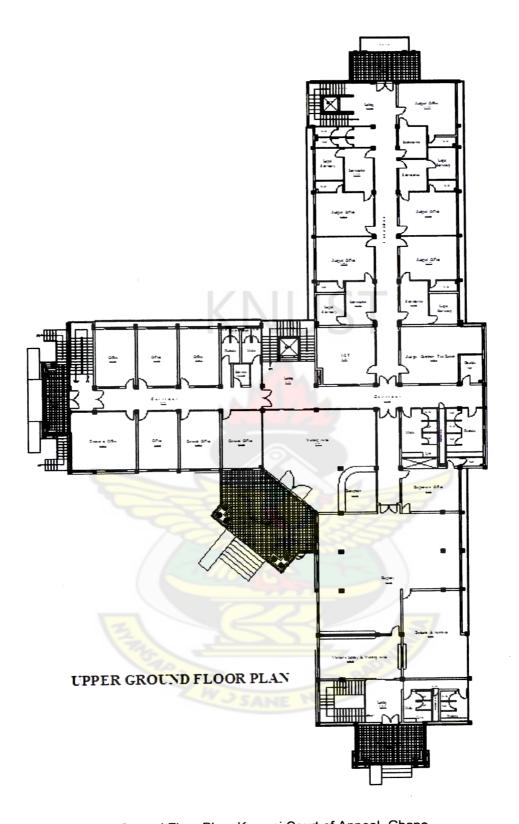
Upper Ground Floor Plan. Kumasi Court of Appeal, Ghana.
